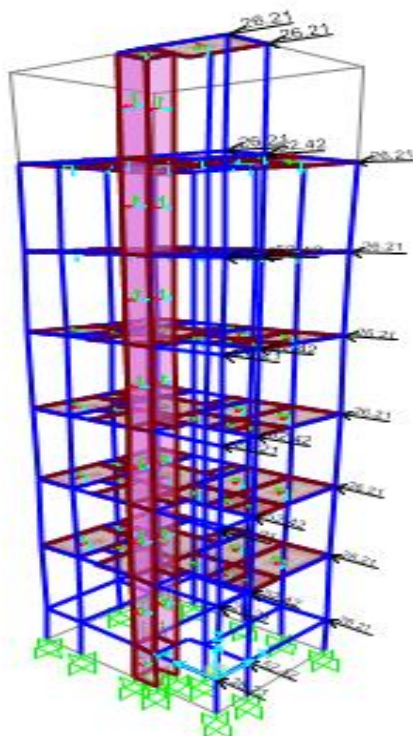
100 kg TNT blast load applied at front face of building as joint load at 30m stand-off distance (With shear wall)
